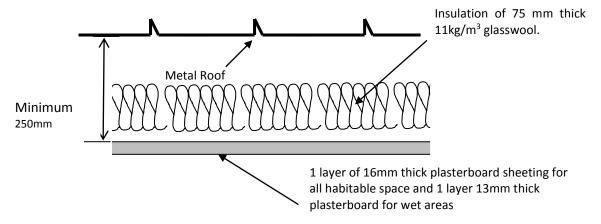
Roof / Ceiling Construction Below Light Weight Roof
